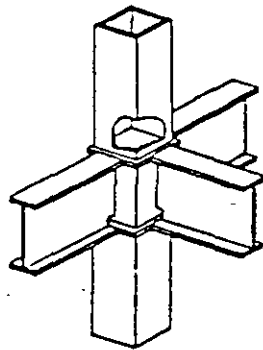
Example of bracket-type connection using wide-flange beams
